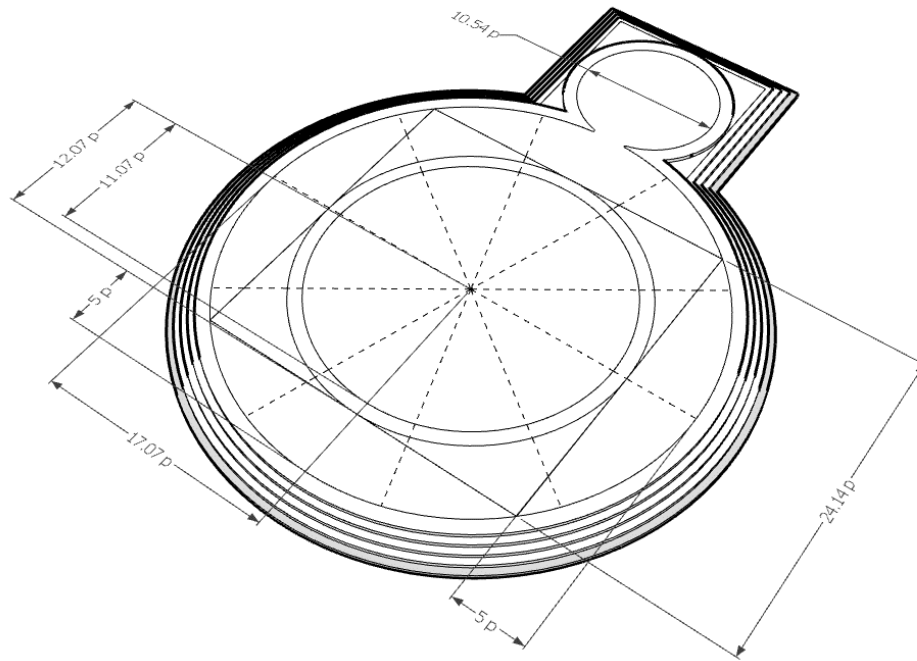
Proportions and dimensions of the plan Fig. 3.18) Interior elevation Fig. 3.19) Interior cross-section elevation
